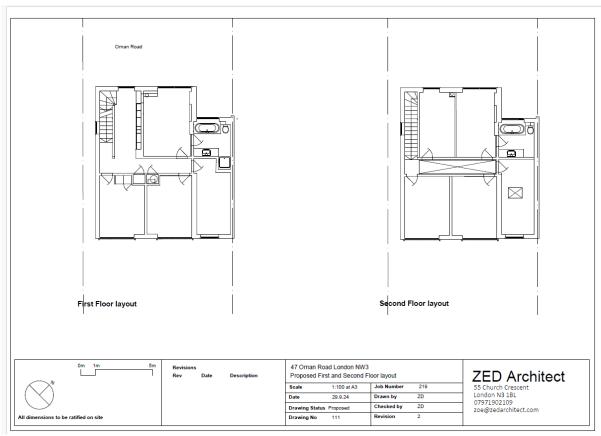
Proposed first floor and second floor plans (Source: submitted drawings)
